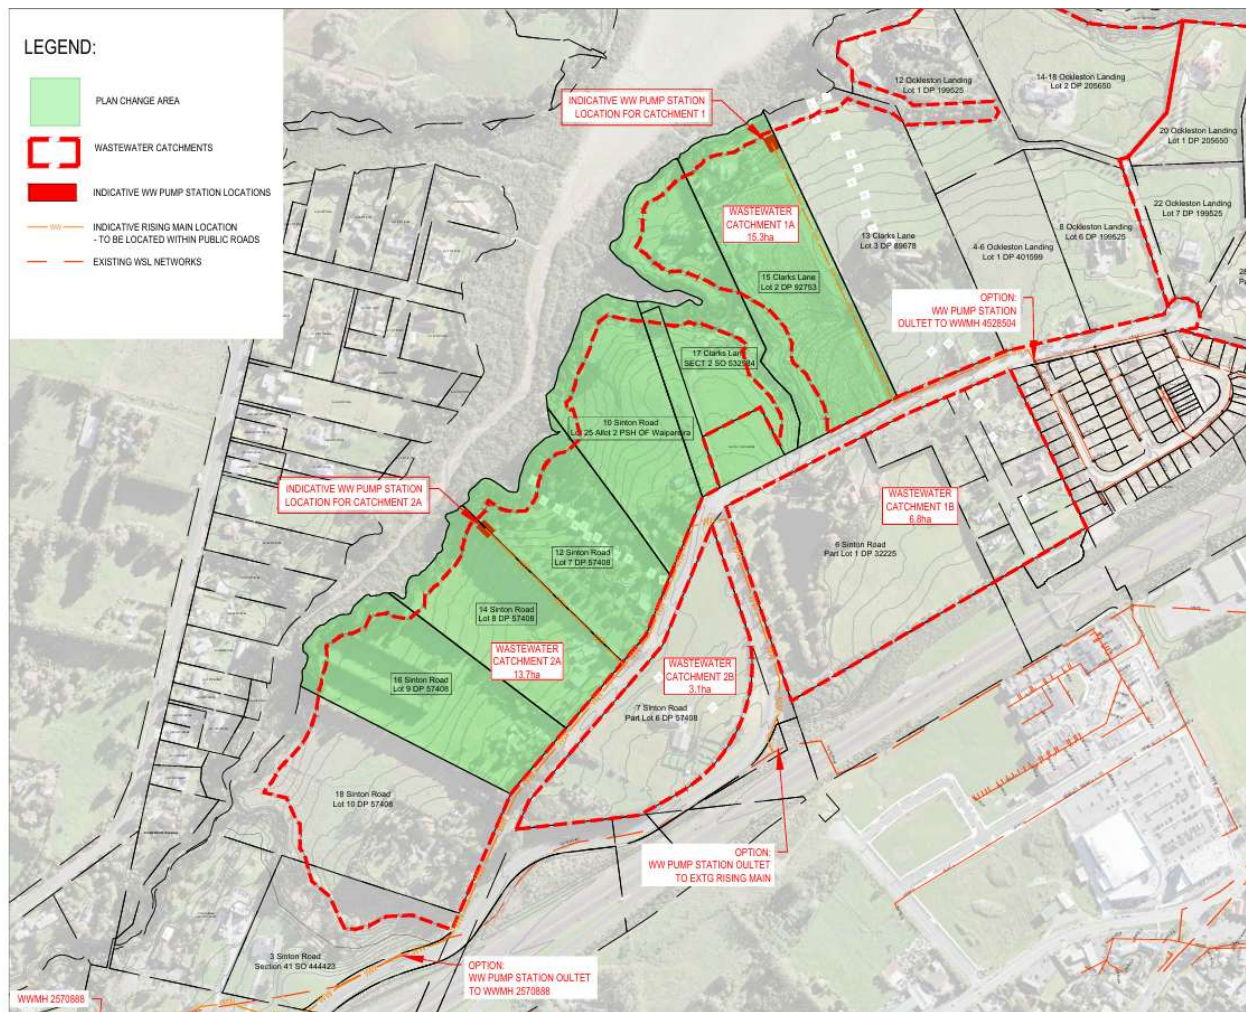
Wastewater Servicing Plan – Plan Change Area shown in green
